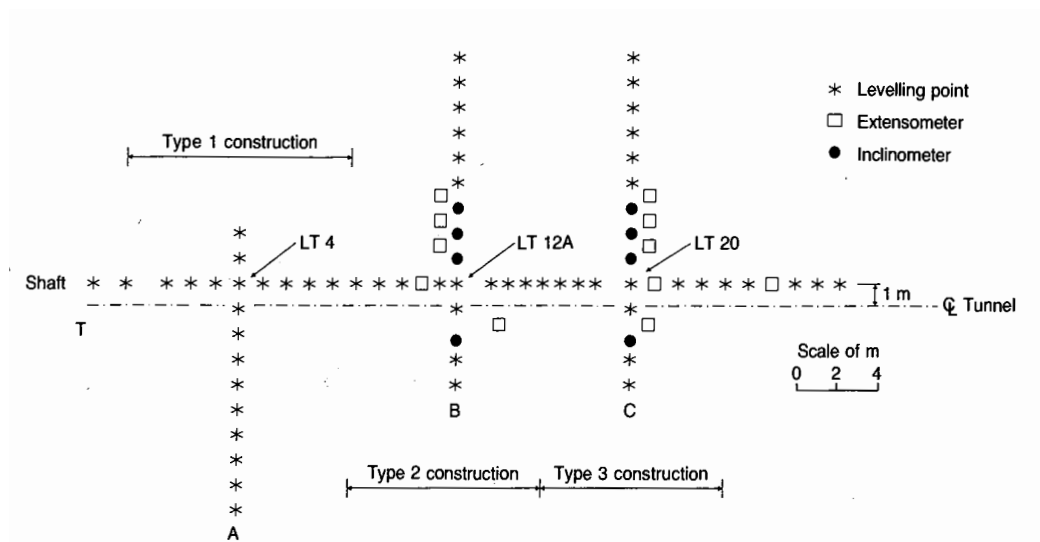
Instrumentation Layout at HEX test site (Deane and Bassett, 1995)
